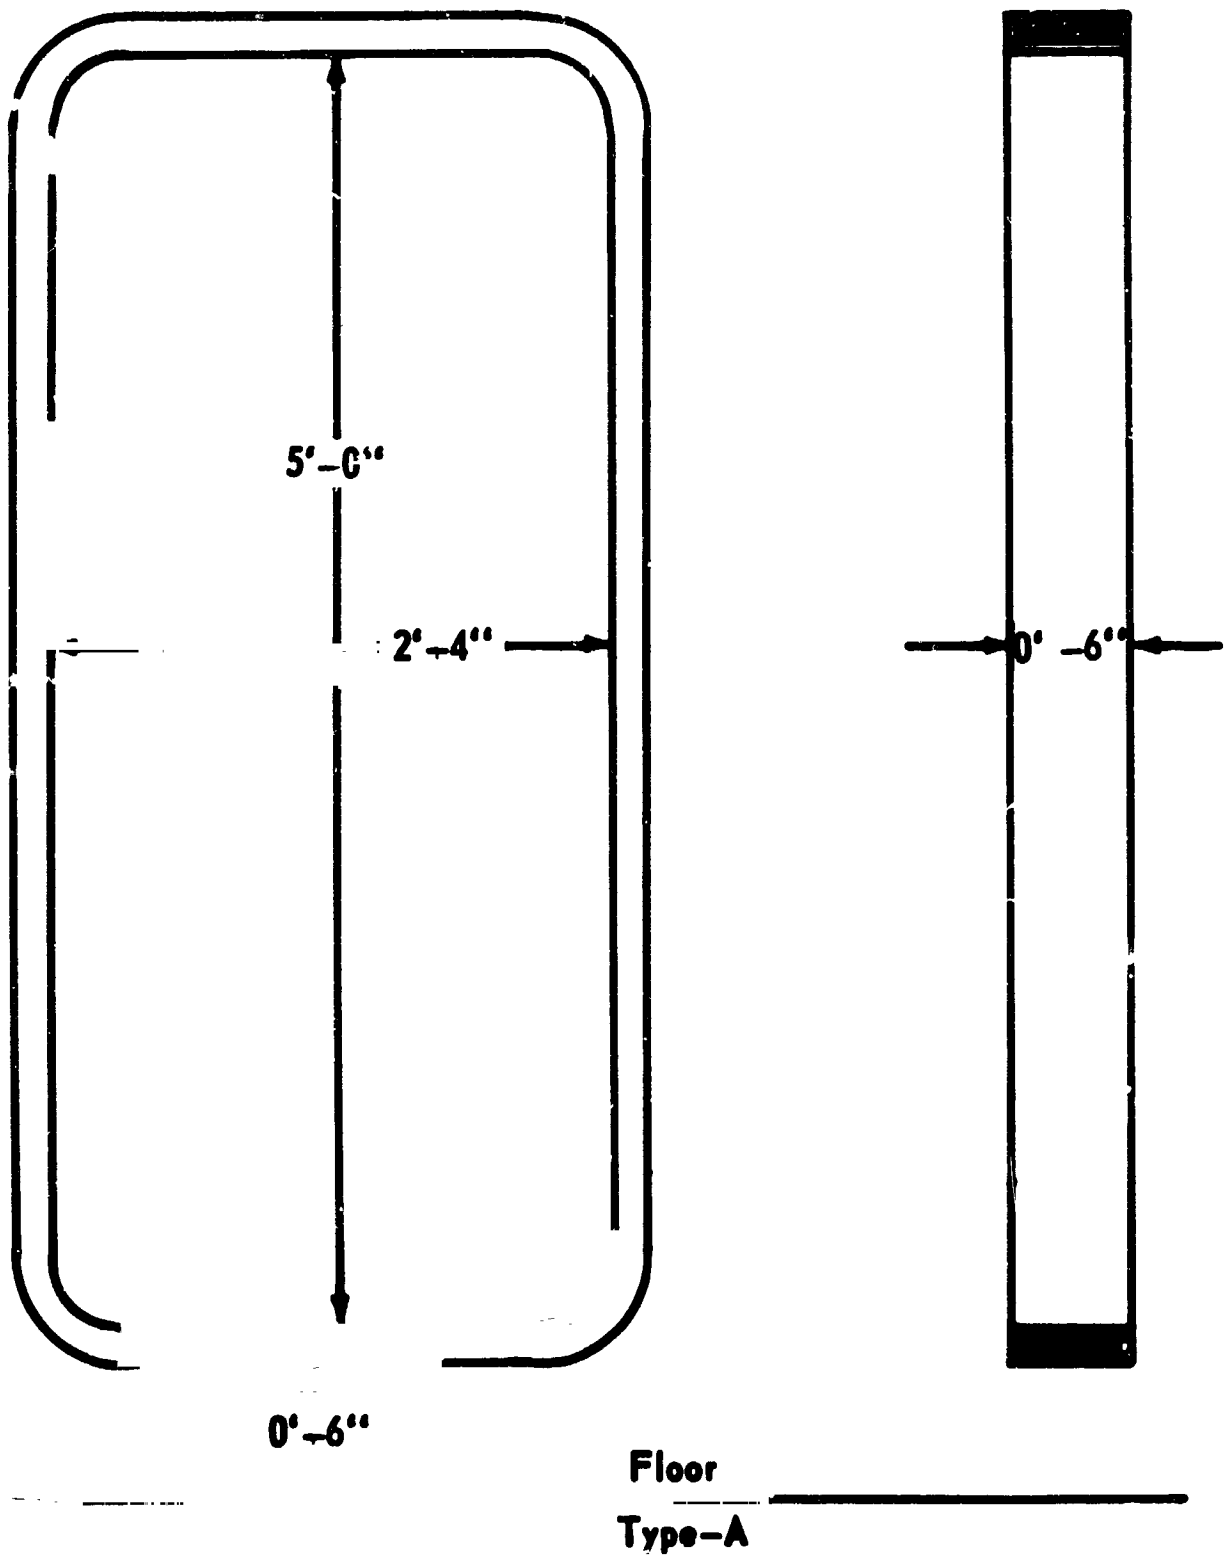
Basic Geometric Configuration - Minimum Clearance Dimensions
